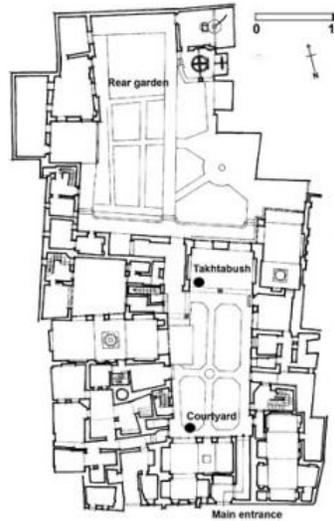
Al-Suhaymi house ground floor plan. Shaddy Attia: (2006)
